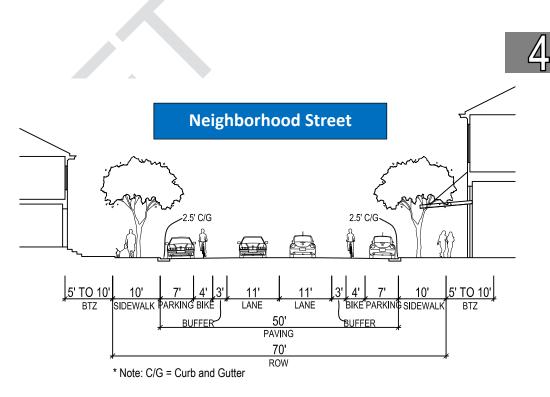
Street Type 3: Neighborhood Street Cross Section
